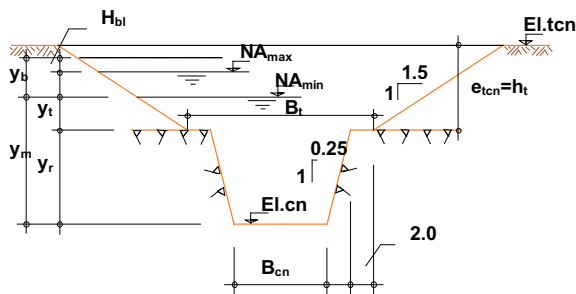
Typical cross-section of a headrace canal excavated through soil and rock (case 1).
